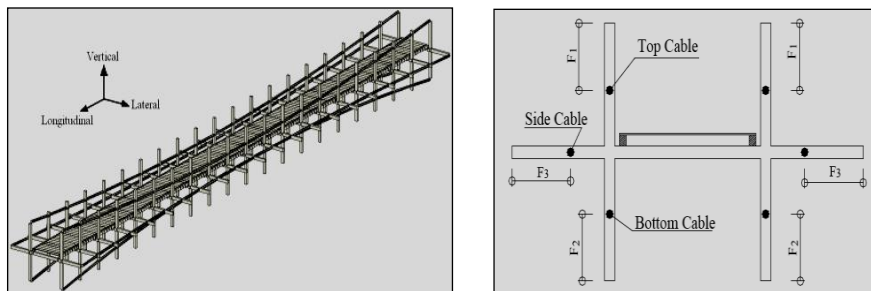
Cable supported footbridge model: isometric view (left) and cross-section (right)
